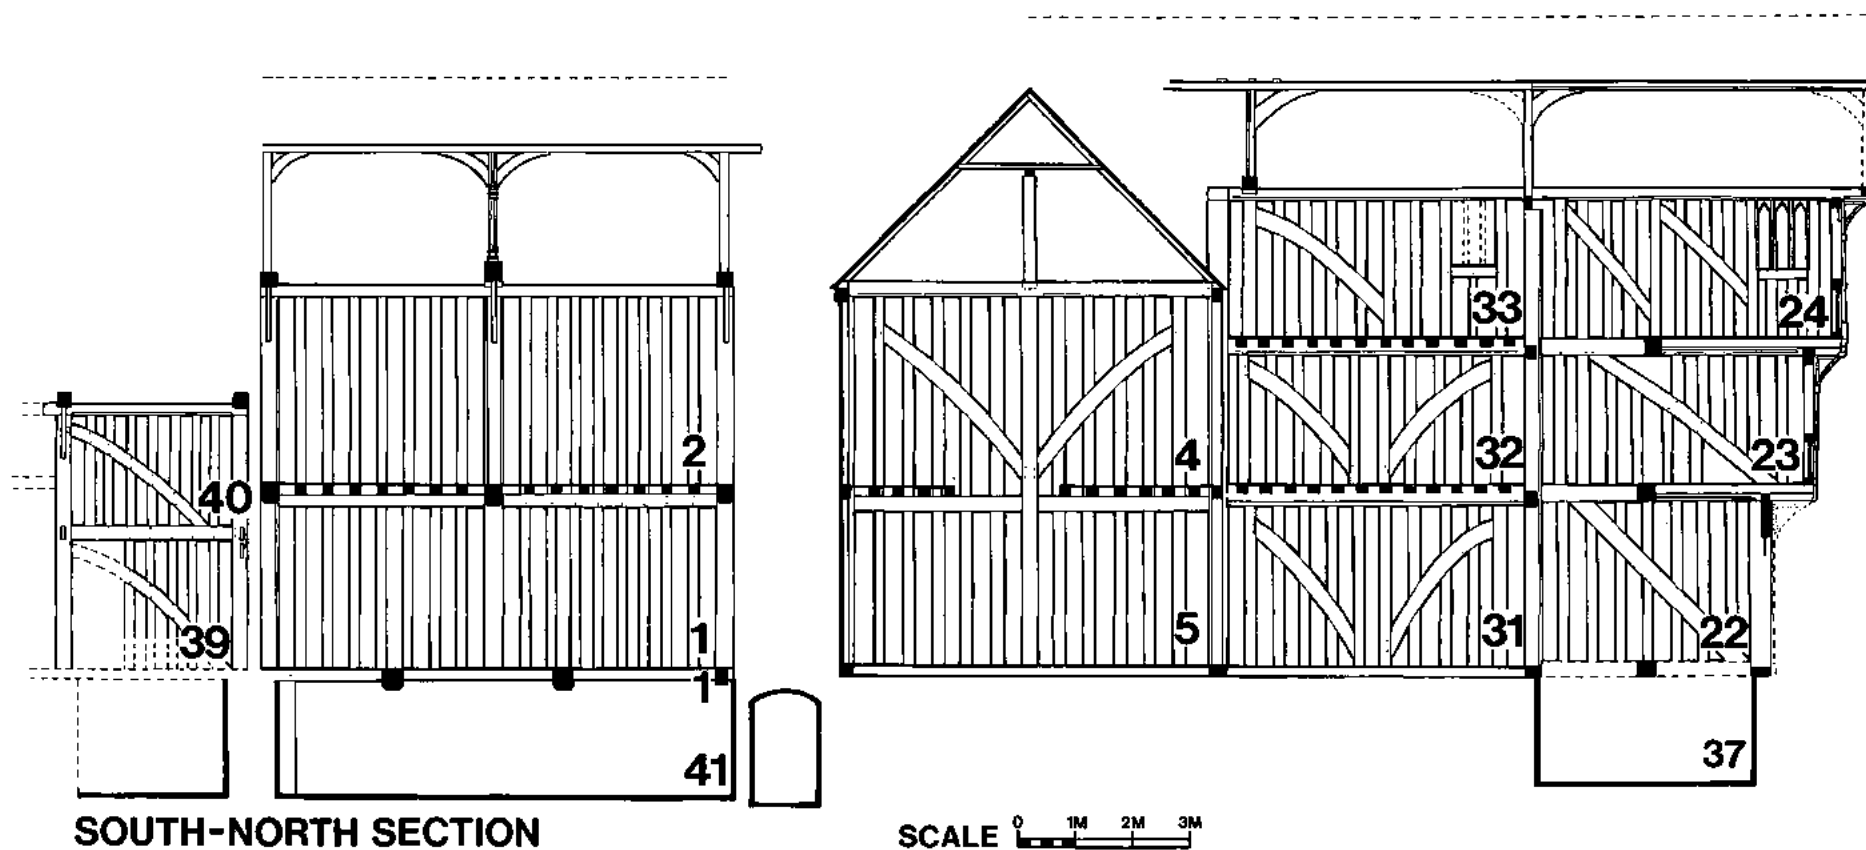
The Red Lion, Colchester. Section through the west wing and southern hall, from south (left) to north (right). For position of this section refer to Fig. 3.
